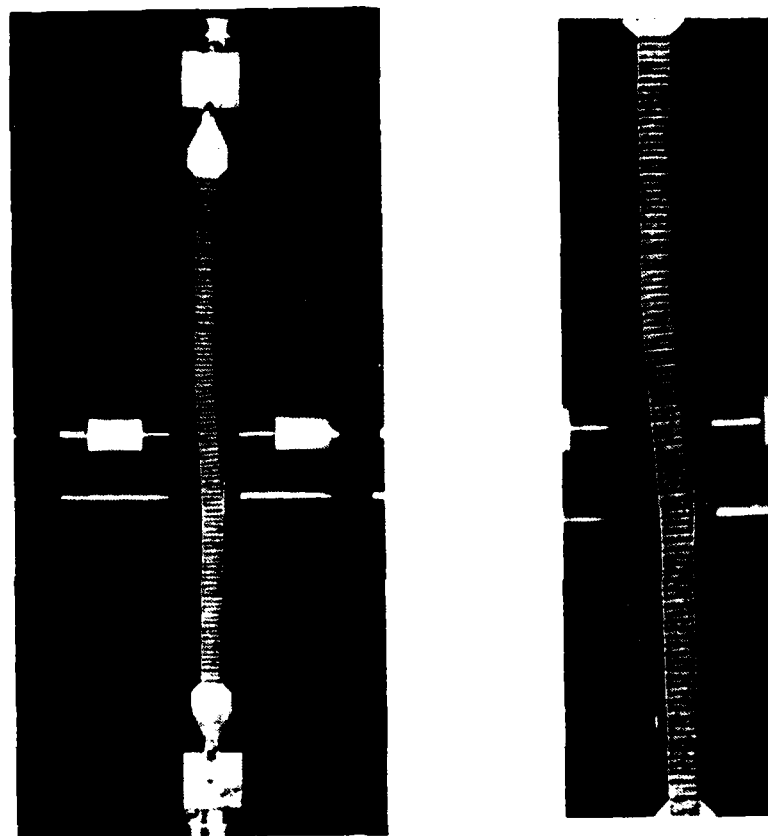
BUCKLING FAILURE OF SPECIMEN NINE
